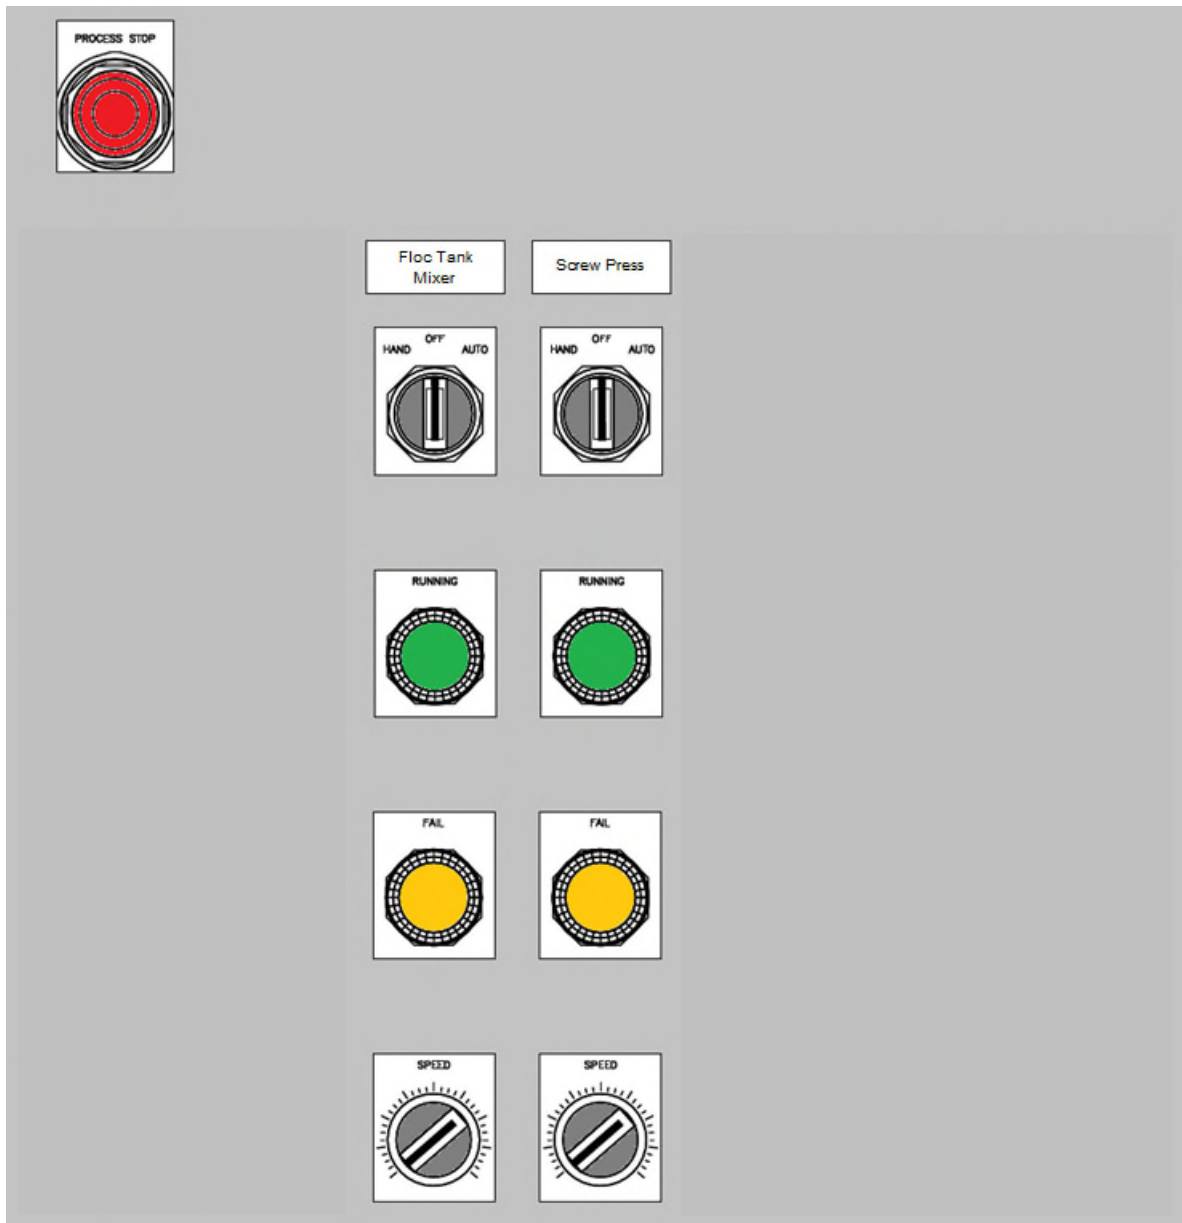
Example Control Panel Door Layout – EXAMPLE ONLY. Actual layout may vary.
